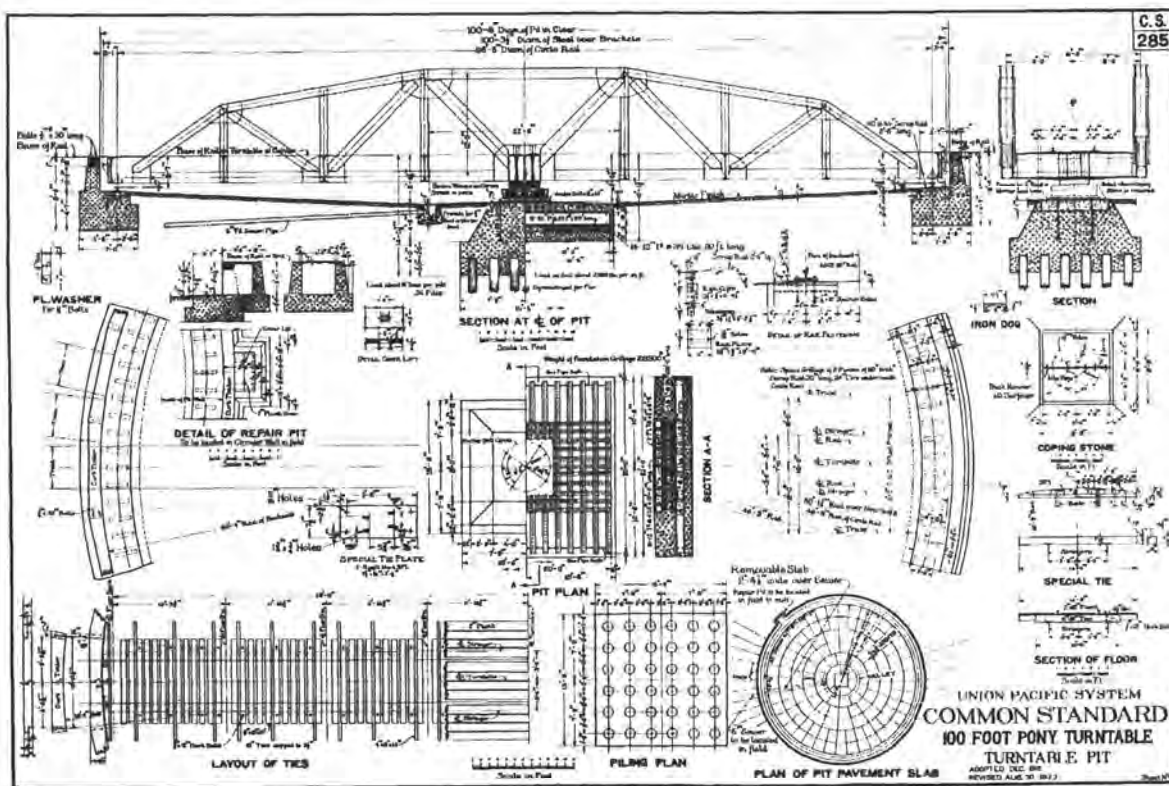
Union Pacific Railroad standard 100-foot pony truss turntable, December 1912.
